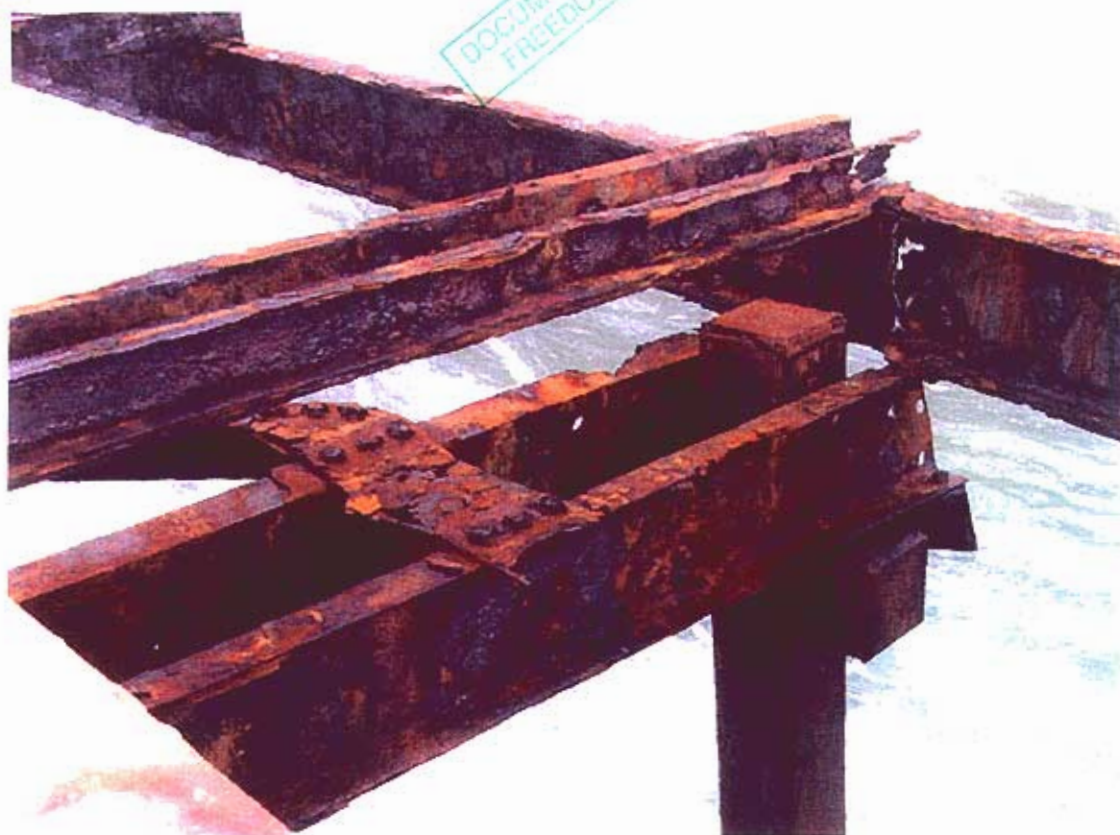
Steelwork Corrosion, Bent 16 - Western Side
